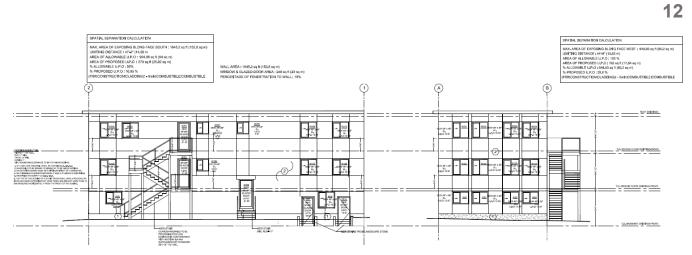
Building elevations of south corner (left image) and rear east (right image) side of building, following the renovations.
